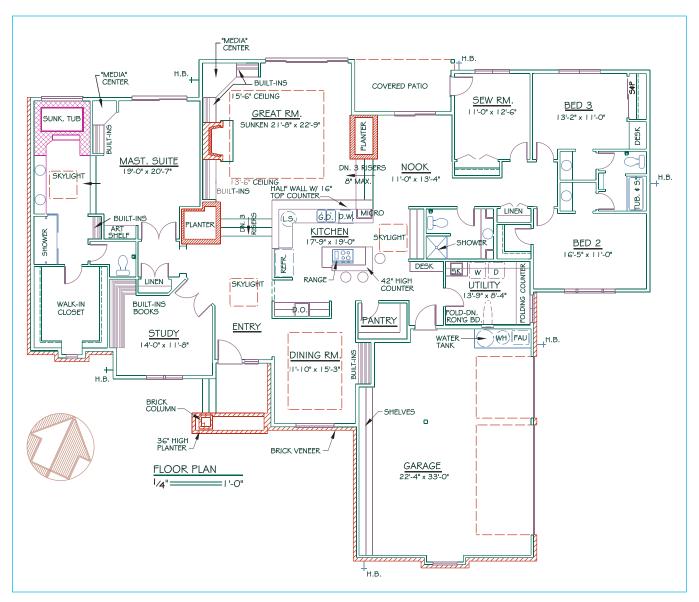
Bubble drawings are converted to scale drawings so that basic sizes can be determined. The preliminary floor plan contains enough text to convey ideas to the owner, but will require additional annotation to be added for the construction process.
